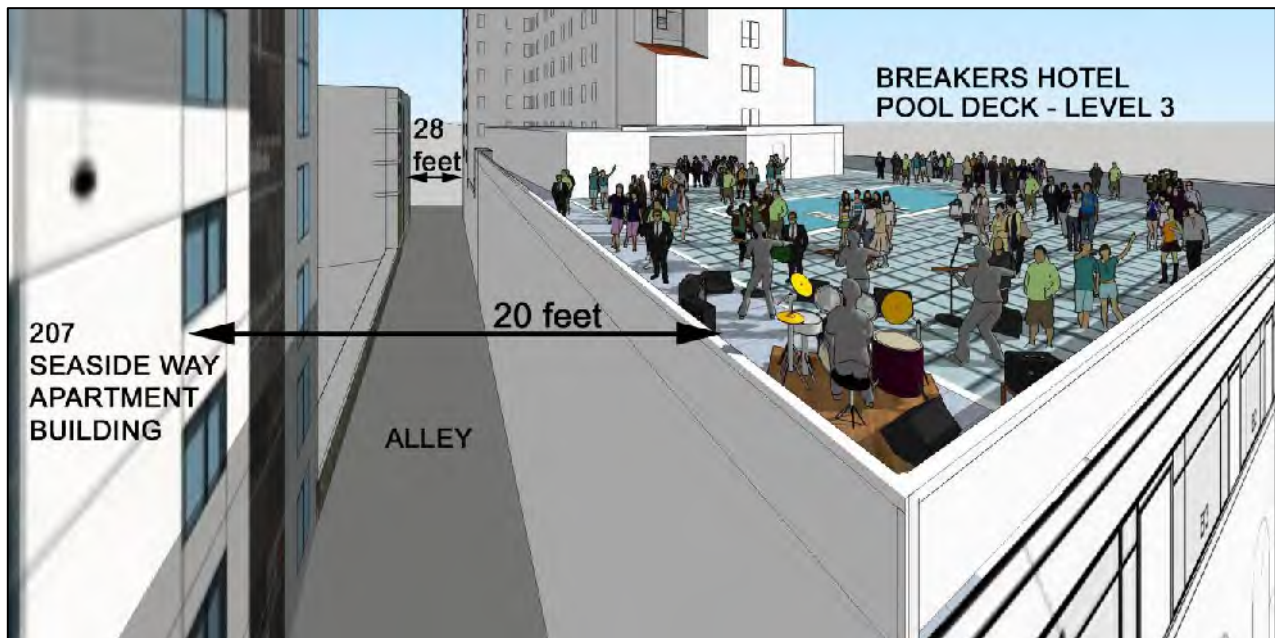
2<sup>nd</sup> & 3<sup>rd</sup>-Level Rooftop Plan (Showing Proximity to Neighboring Apartments)
